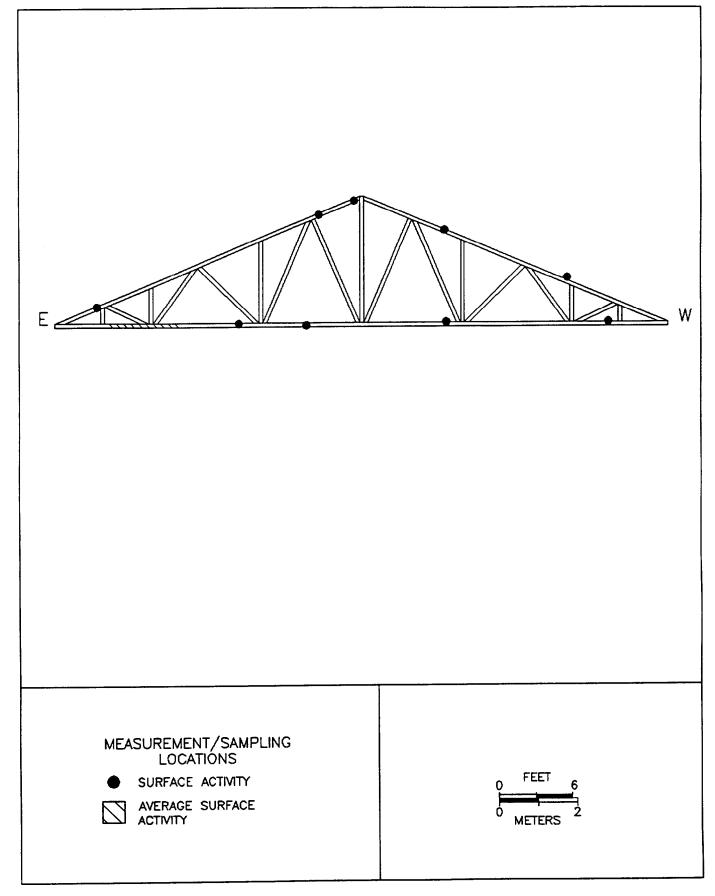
Building 3, Truss 3 — Measurement and Sampling Locations
